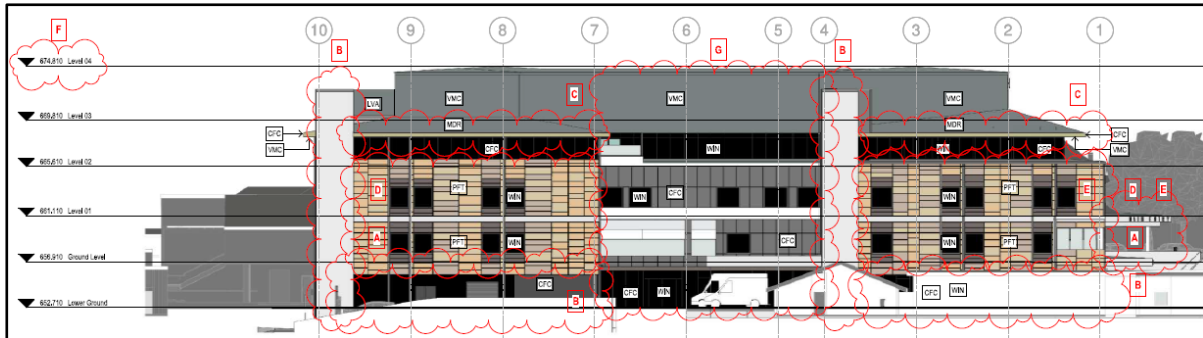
| Proposed East elevation (Source: Modification 2 Application)
